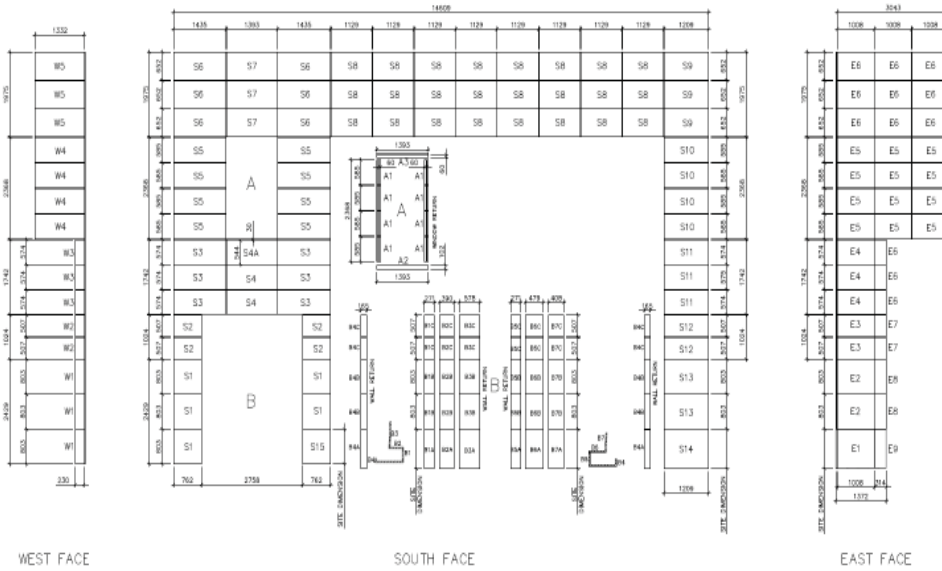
2D Layout Design of Building Walls (Cinergy Medical Building)
